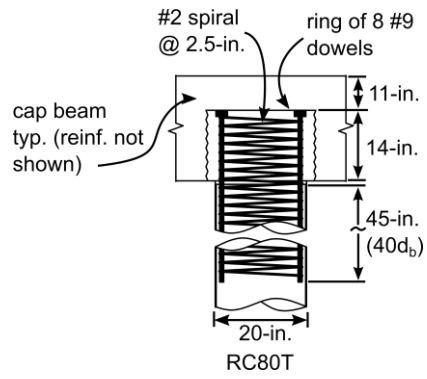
Connection Details for Embedded Dowel Connection Specimen
